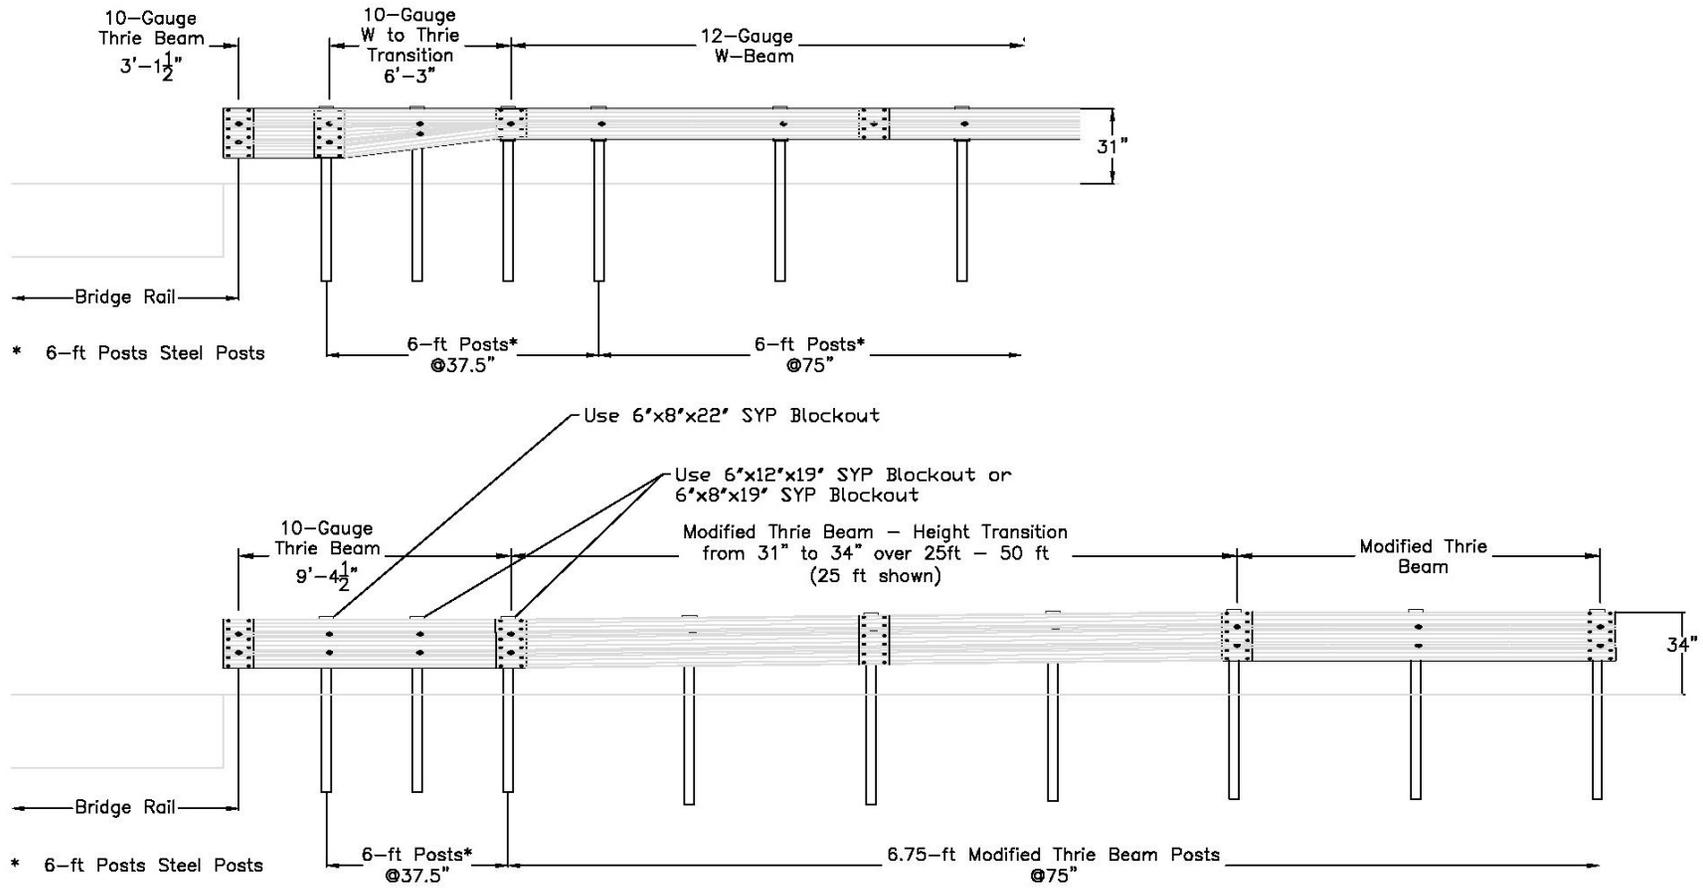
Modified Thrie Beam Transition to MASH TL-2 Thrie-Beam AGT
